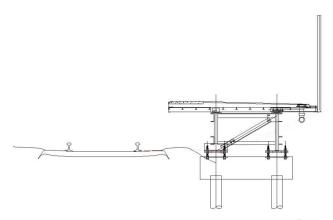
Cross-section of a typical Rail Modular Platform System.
